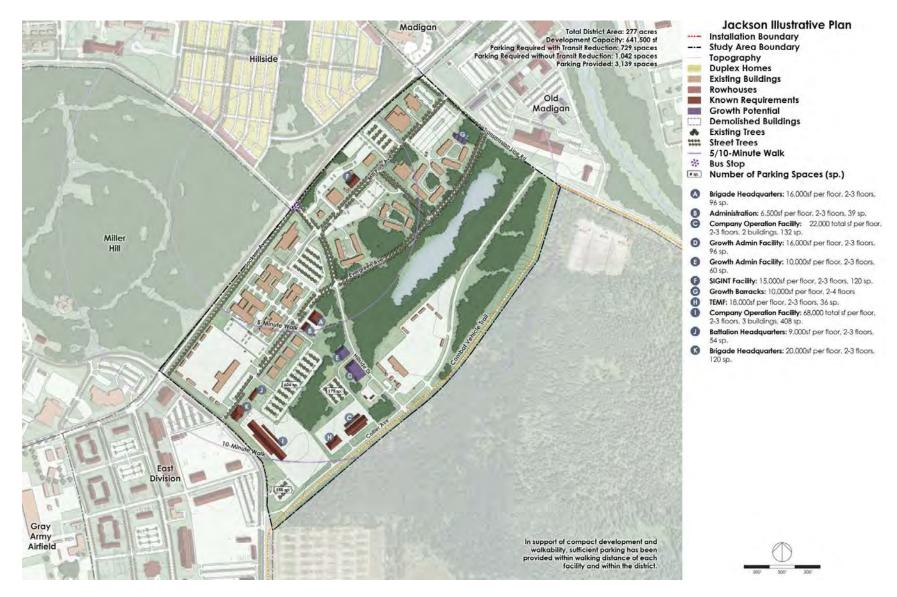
Jackson Area Development Plan Illustrative Plan
